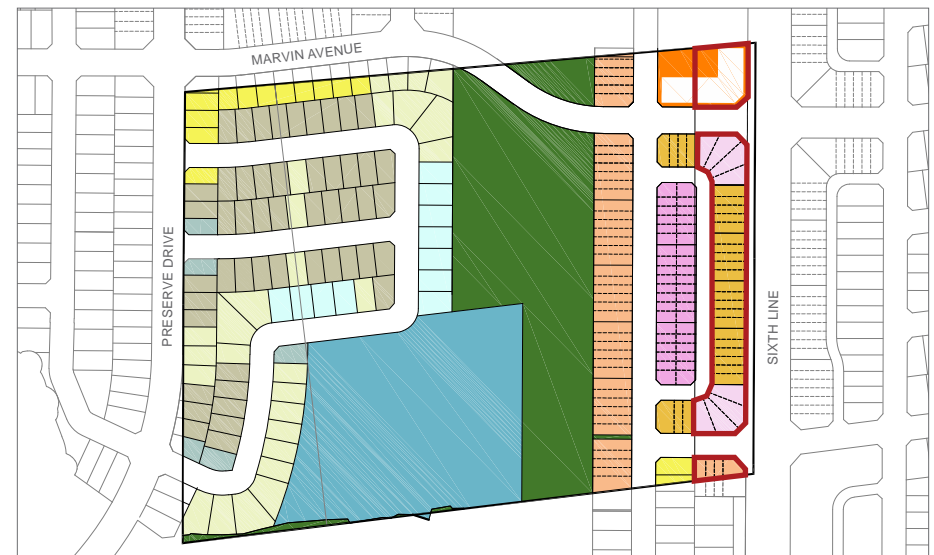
Location of mixed-use building and townhouses as a component of the Neighbourhood Centre Area to the east, along Sixth Line.
